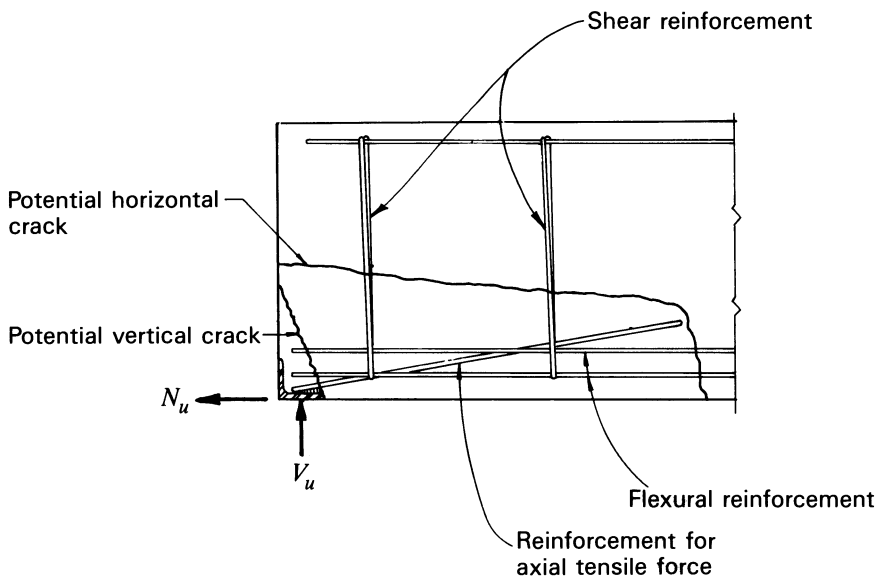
Typical reinforcement for the bottom of a double-tee beam stem at its support.
